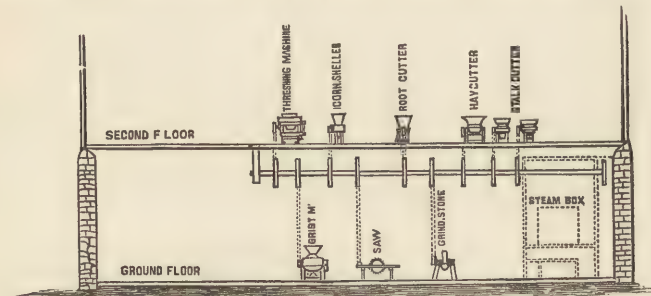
Section of part of Barn, showing long horizontal shaft, which is turned by wire rope from engine, giving motion to the various machines above and below.
